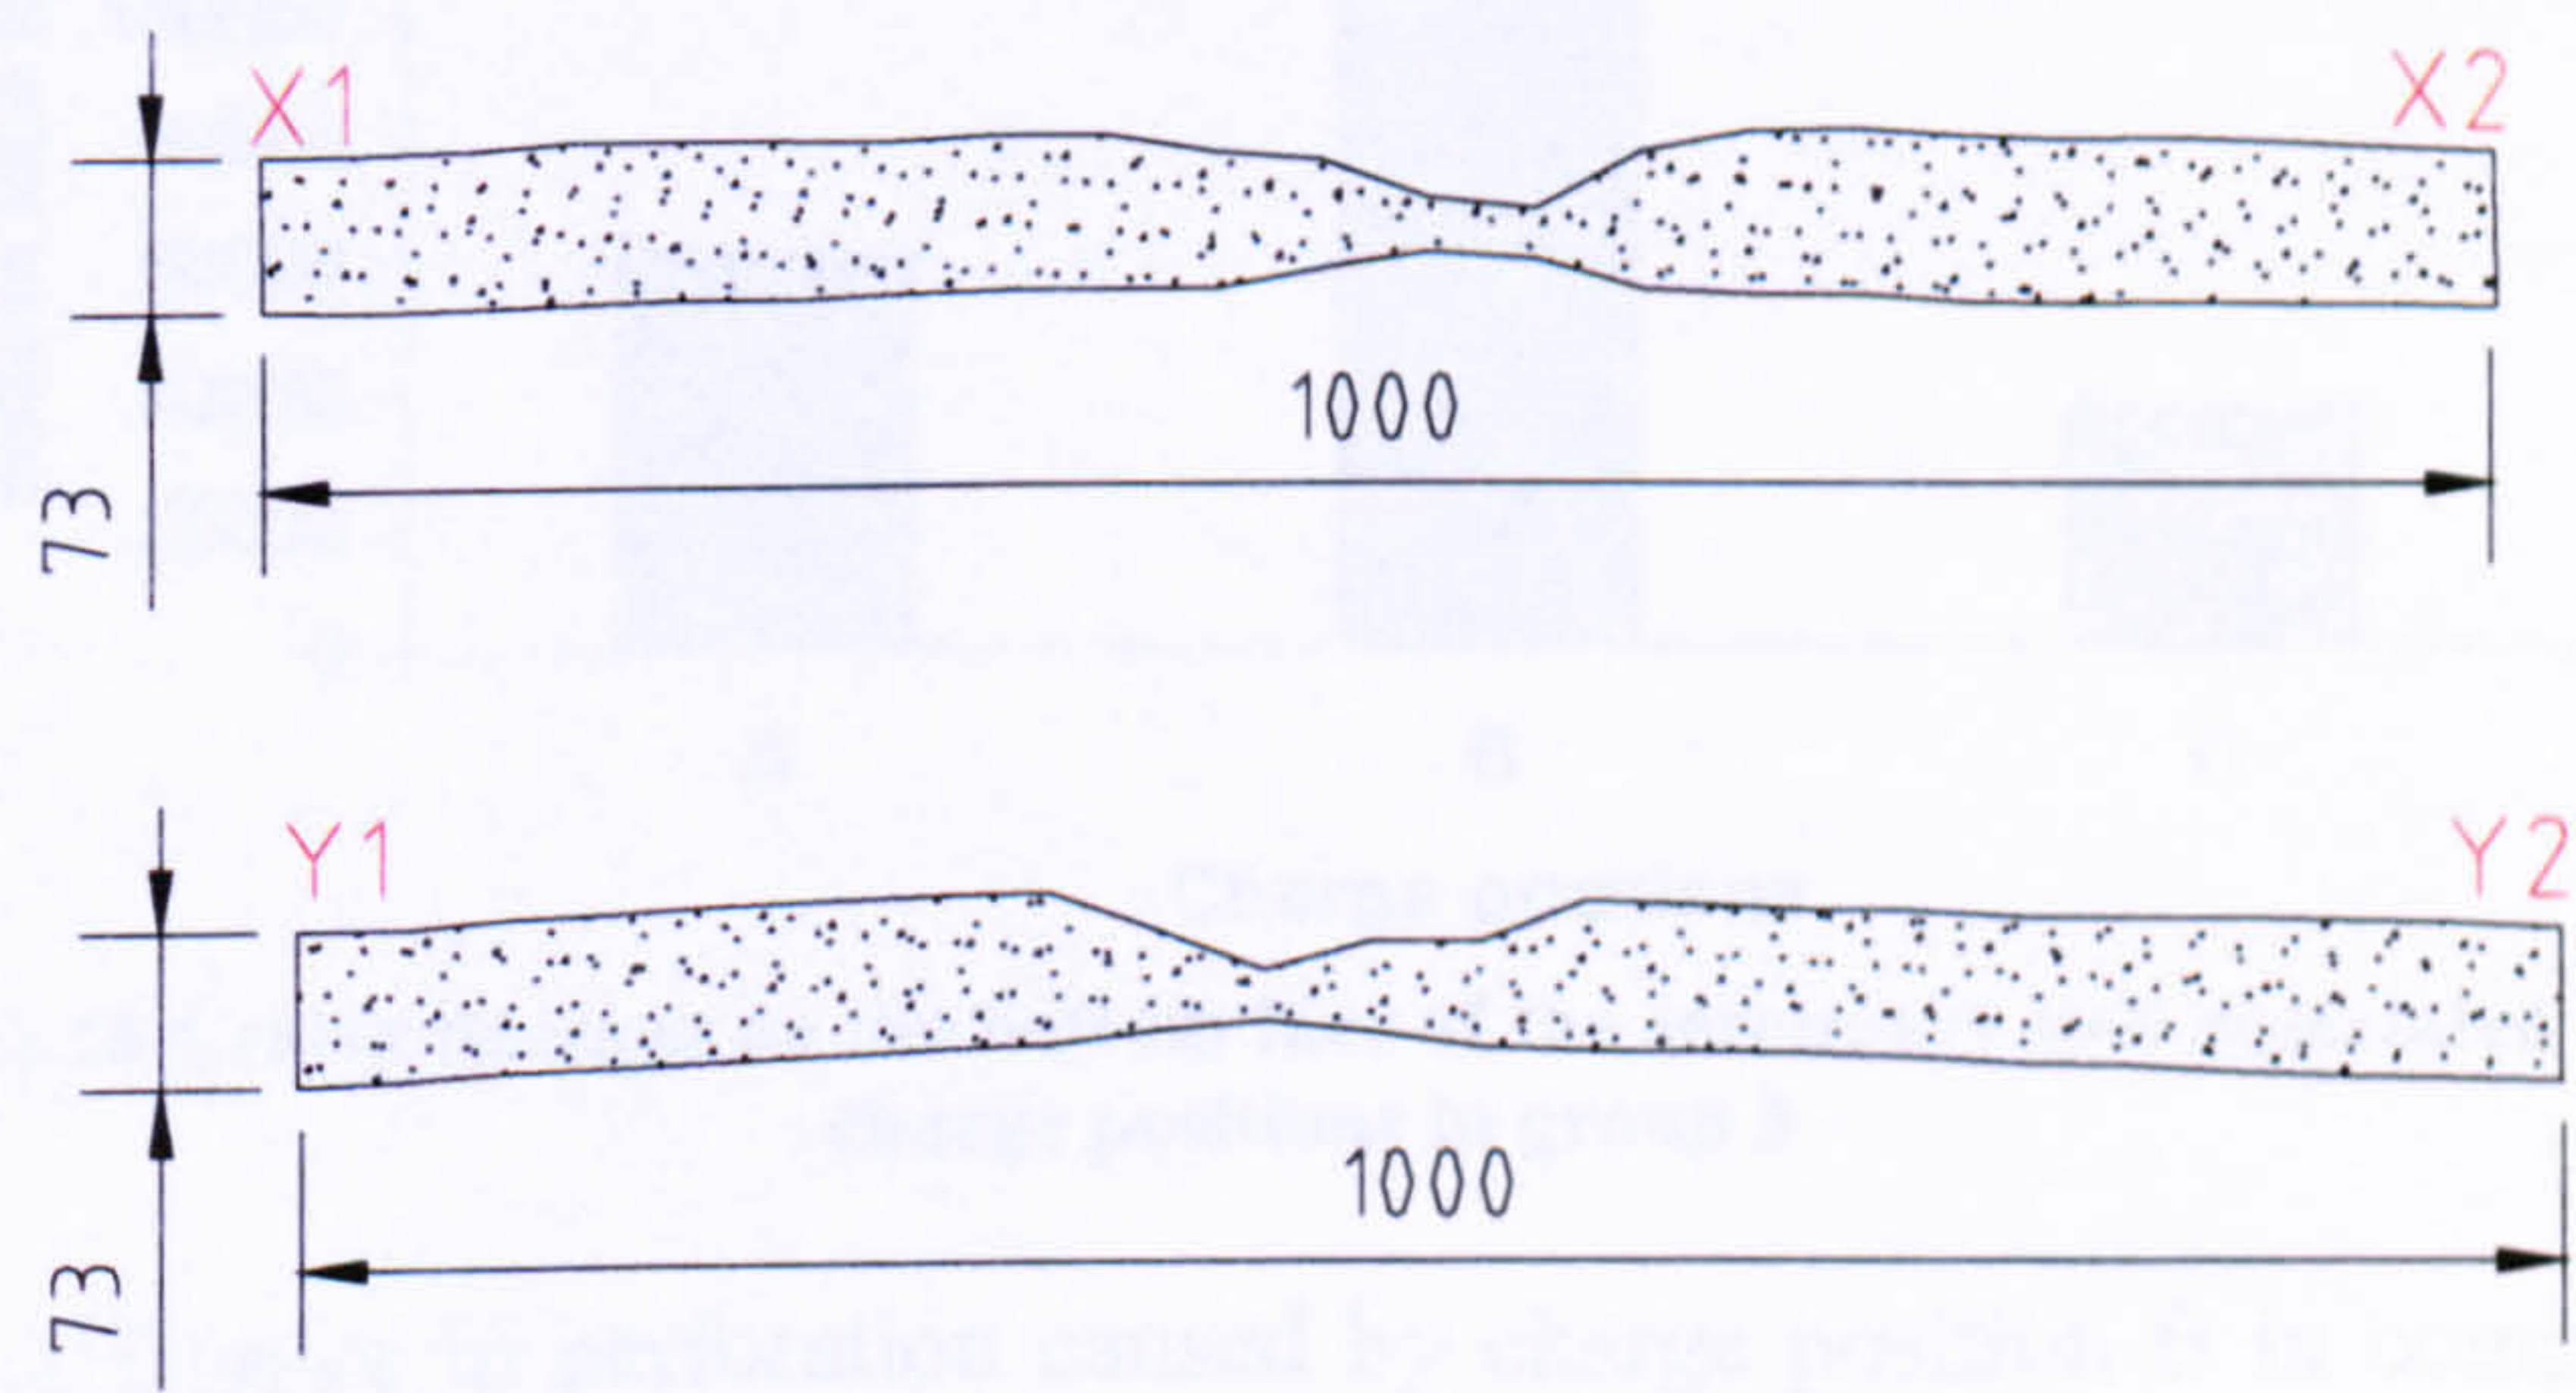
Cross-sectional elevation through X1-X2 and Y1-Y2 of secondary slab RCB73IT11
